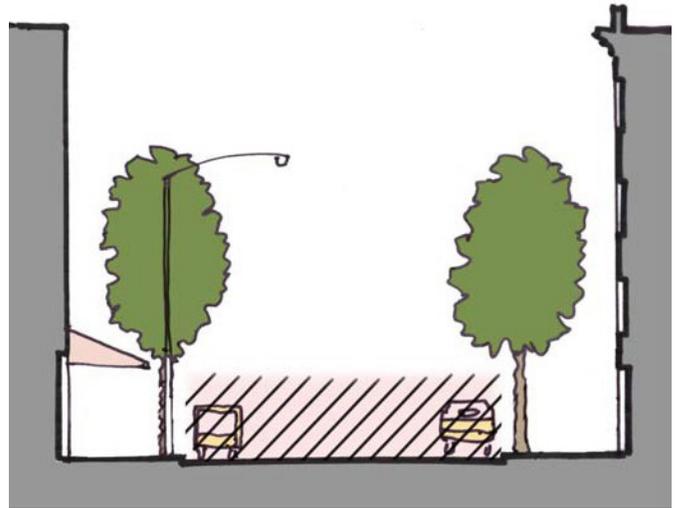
The Travelway Realm occupies the curb-to-curb street cross section within the public right-of-way.
